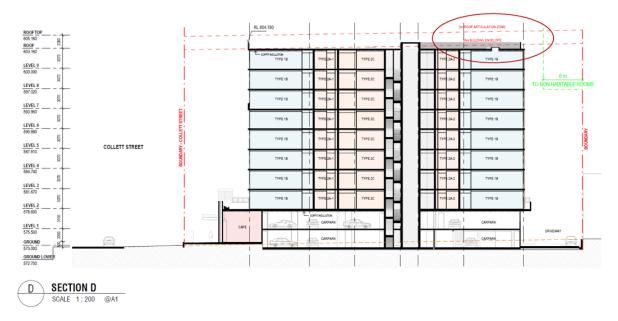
Section D east/west through the building – southern end (Source: Applicant's Clause 4.6 Variation)
